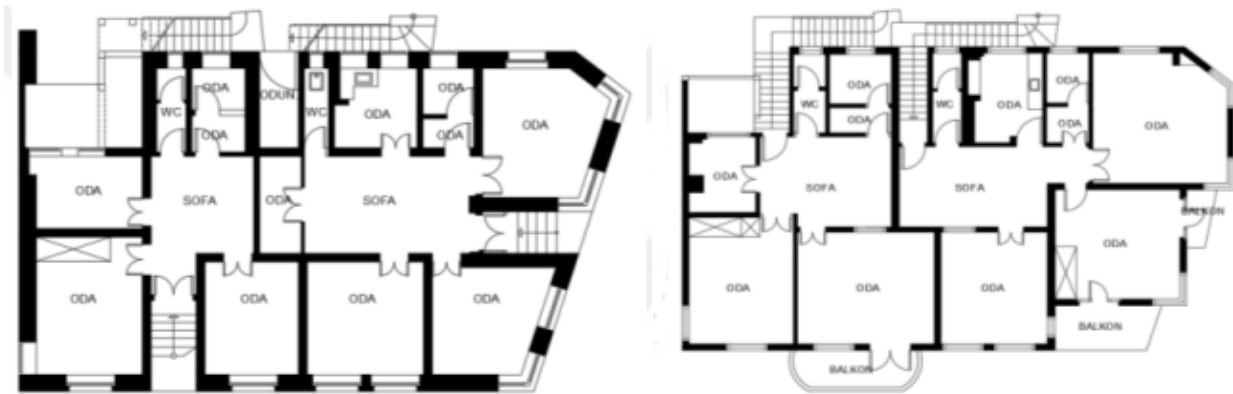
Karaahmet Ground Floor Plan(left), 1<sup>st</sup> Floor Plan (right) (Topbaş,2022).
